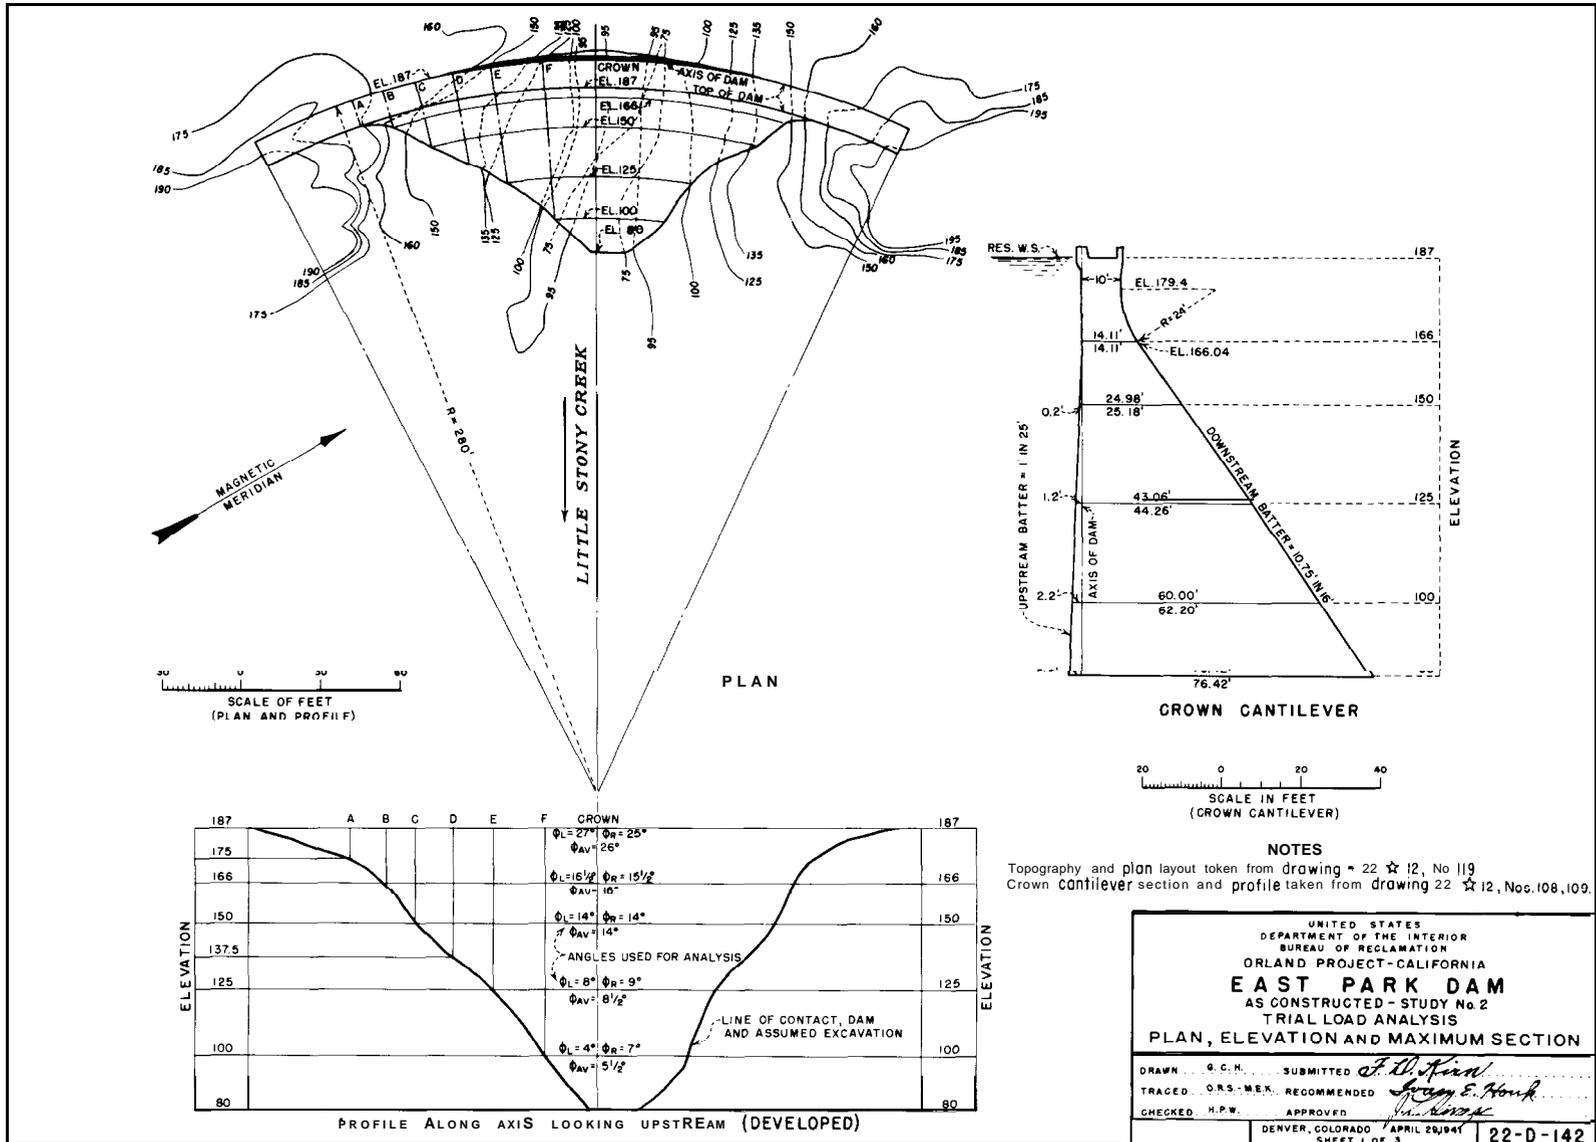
East Park Dam-plan, elevation, and maximum section.
